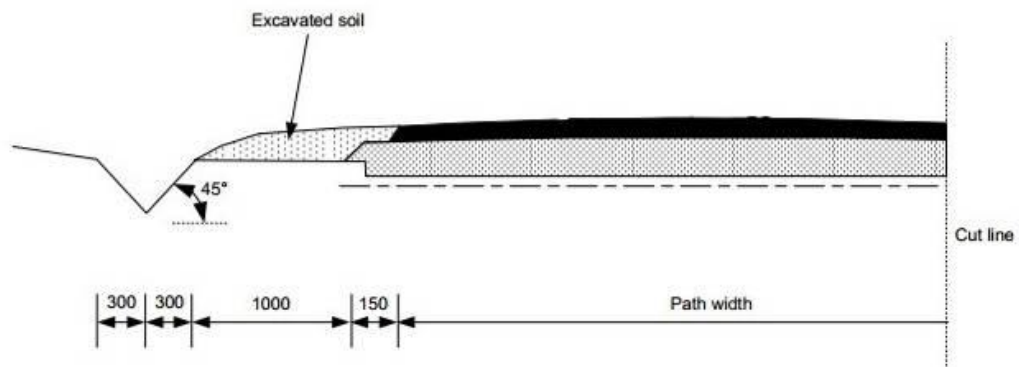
Example of drainage ditch detail for a Greenway. (Source: Sustrans)
